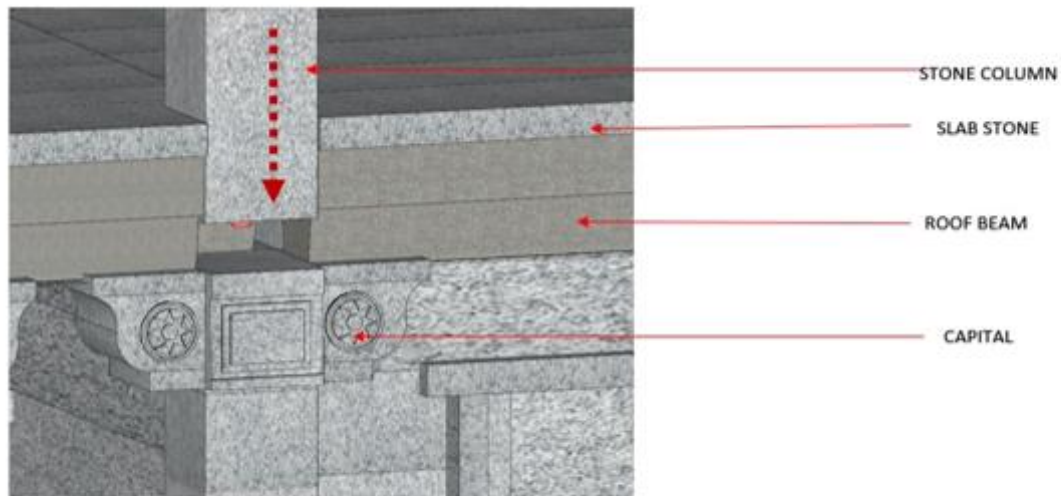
PLACEMENT OF CAPITAL IN BETWEEN BEAMS AND SLAB ON LOWER FLOOR CAPITAL.
